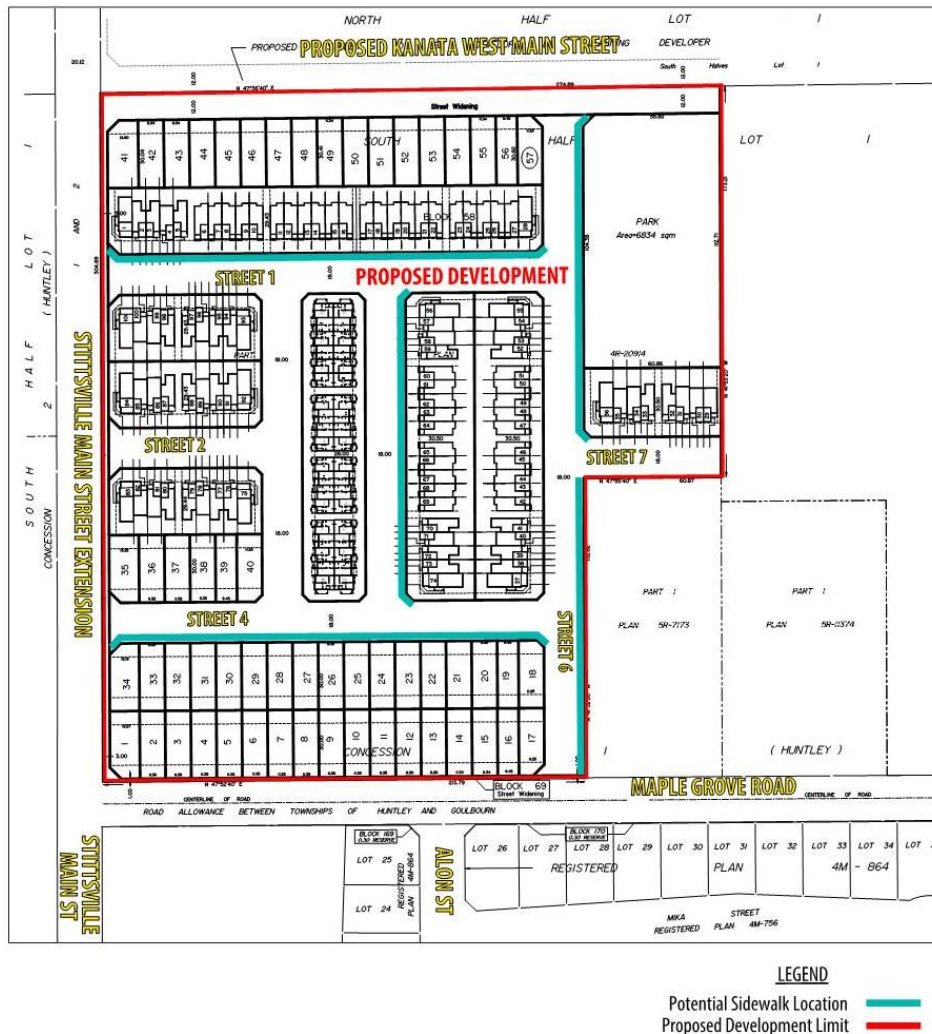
Proposed Streets and Sidewalks shown in the TIA
